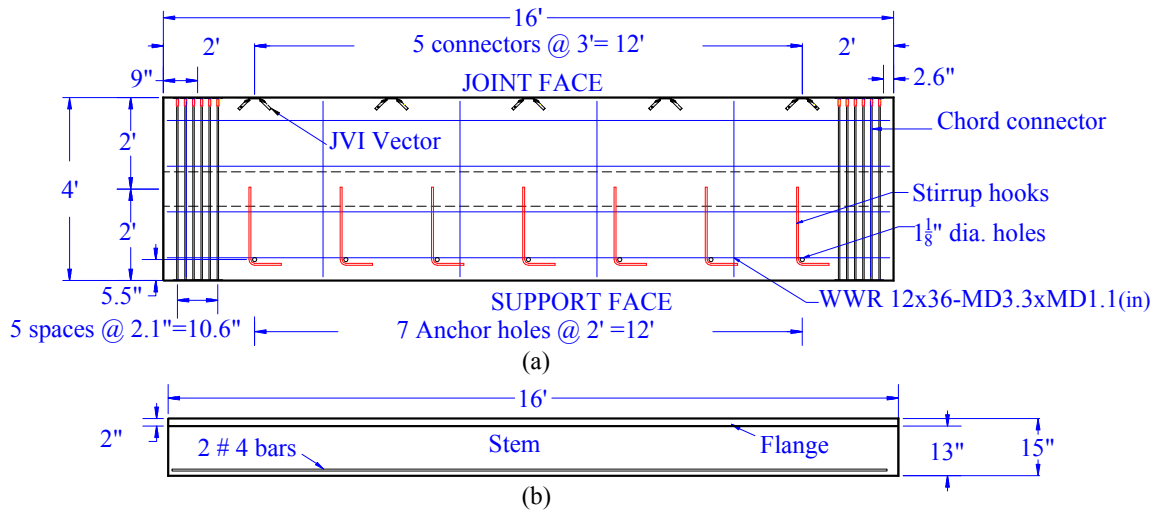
Specimen detail: (a) plan; (b) side elevation (one panel of two).
